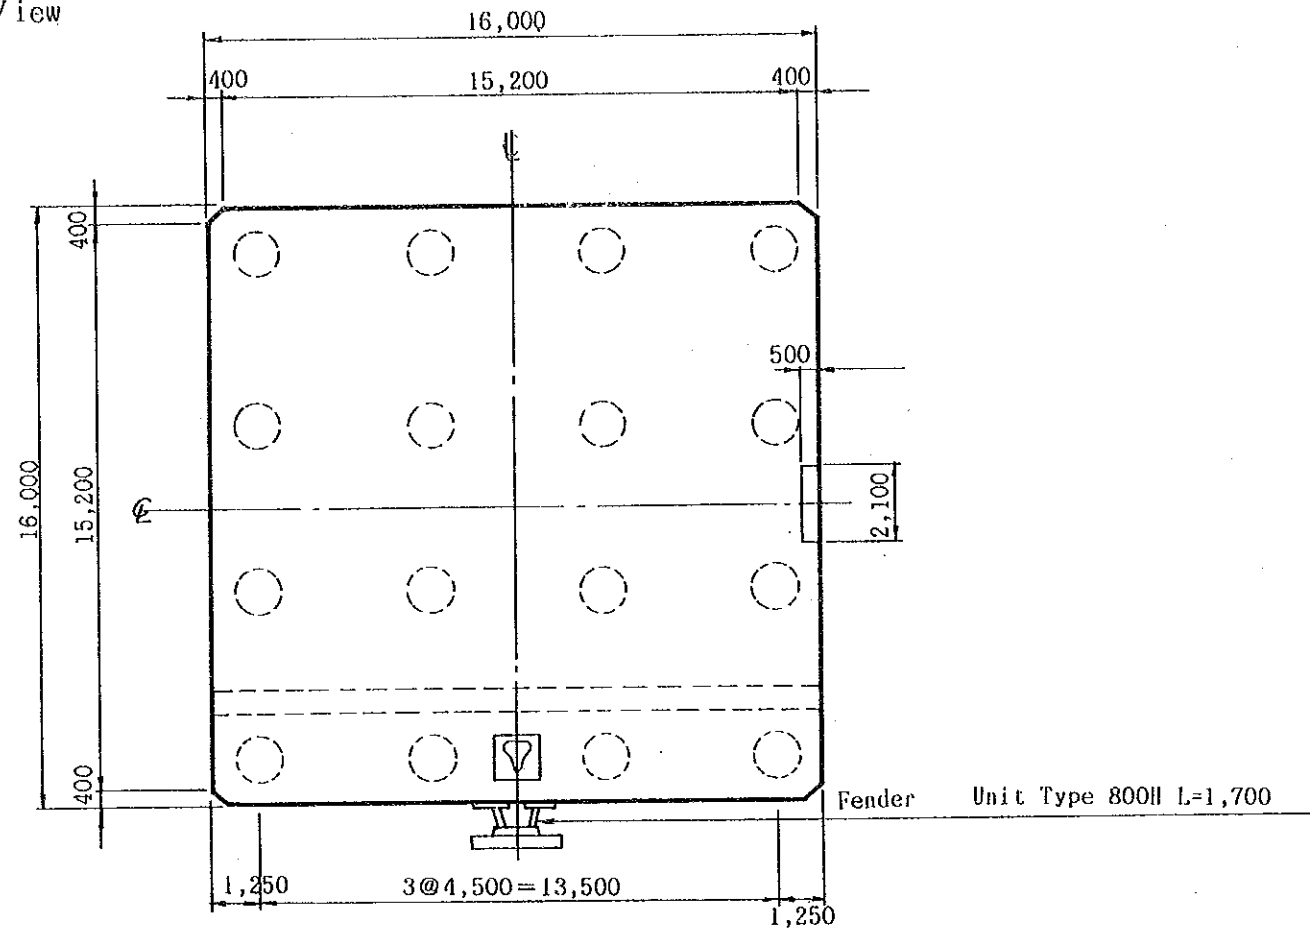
Plan View of Mooring Facilities at Grain Terminal
